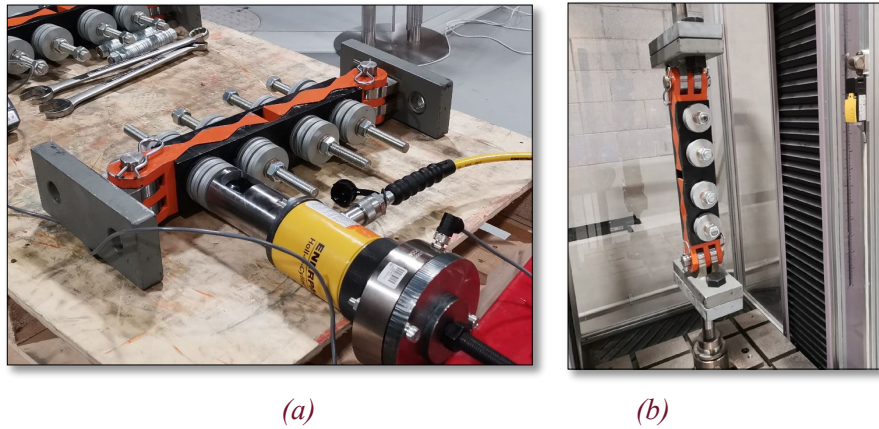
Component test: (a) Pre-stressing joint (b) Testing joint in UTM
